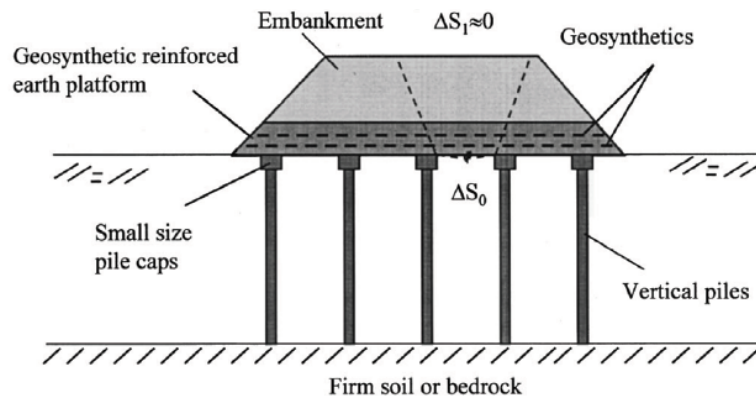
Typical detailing of the pile-supported embankment utilizing a GRLTP (Han and Gabr, 2002).
